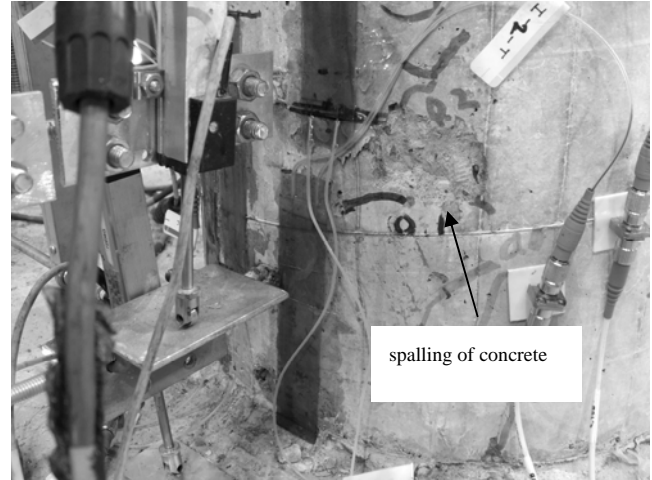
Spalling of concrete at level 2 (150 mm above the base) after event 6 (0.63g PGA)
